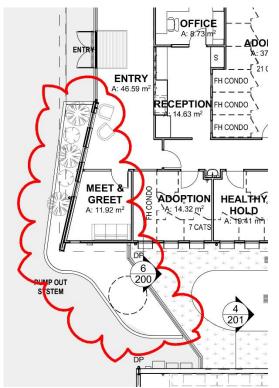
A: Landscape amendment to planting bed at the front of the Animal Shelter building – s.4.55 Modification
